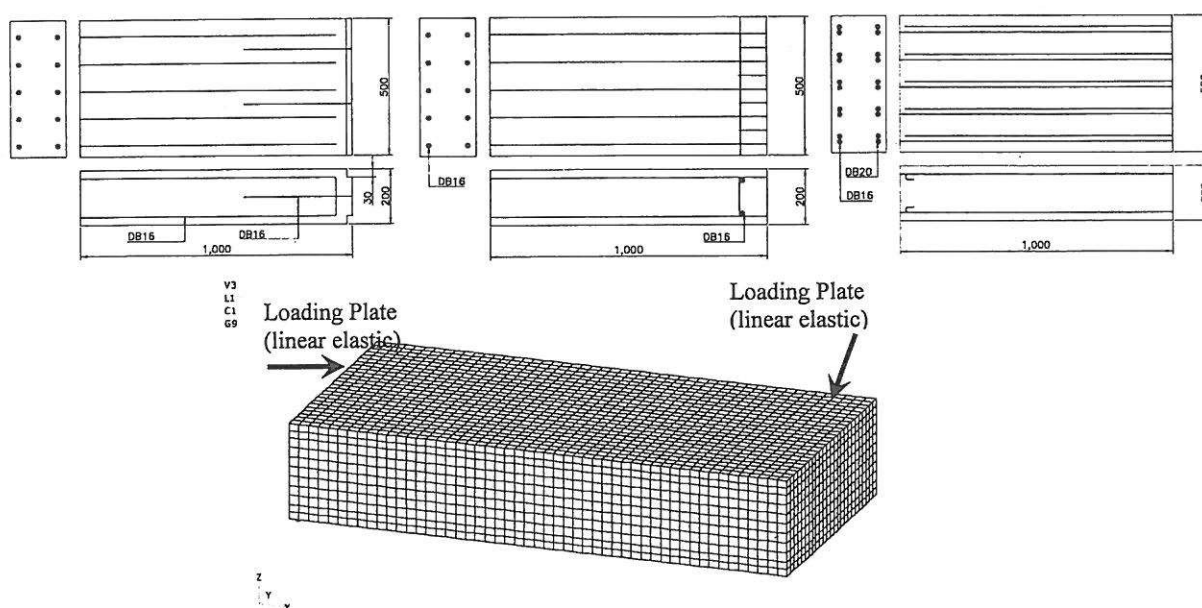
Reinforcement detailing of specimens: LS\_000\_S, LS\_025\_S, LS\_183\_D and Numerical model of link slab specimen with 3 different reinforcement detailings (quarter specimen)
